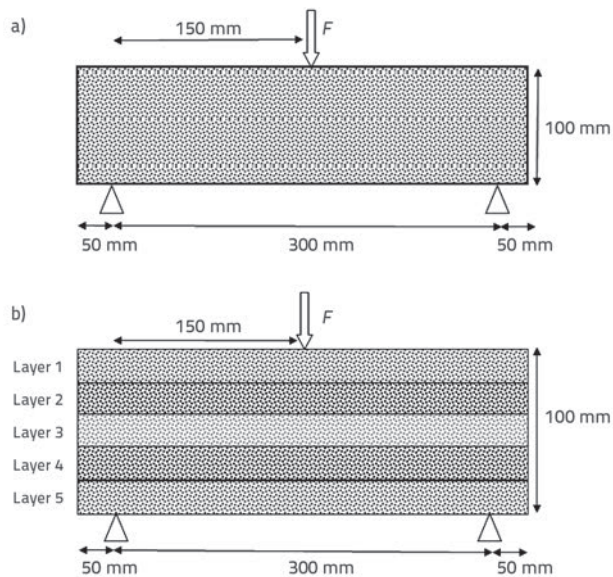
Schematic figures of reinforced concrete: a) entirely reinforced concrete beams; b) functionally graded reinforced concrete beams
